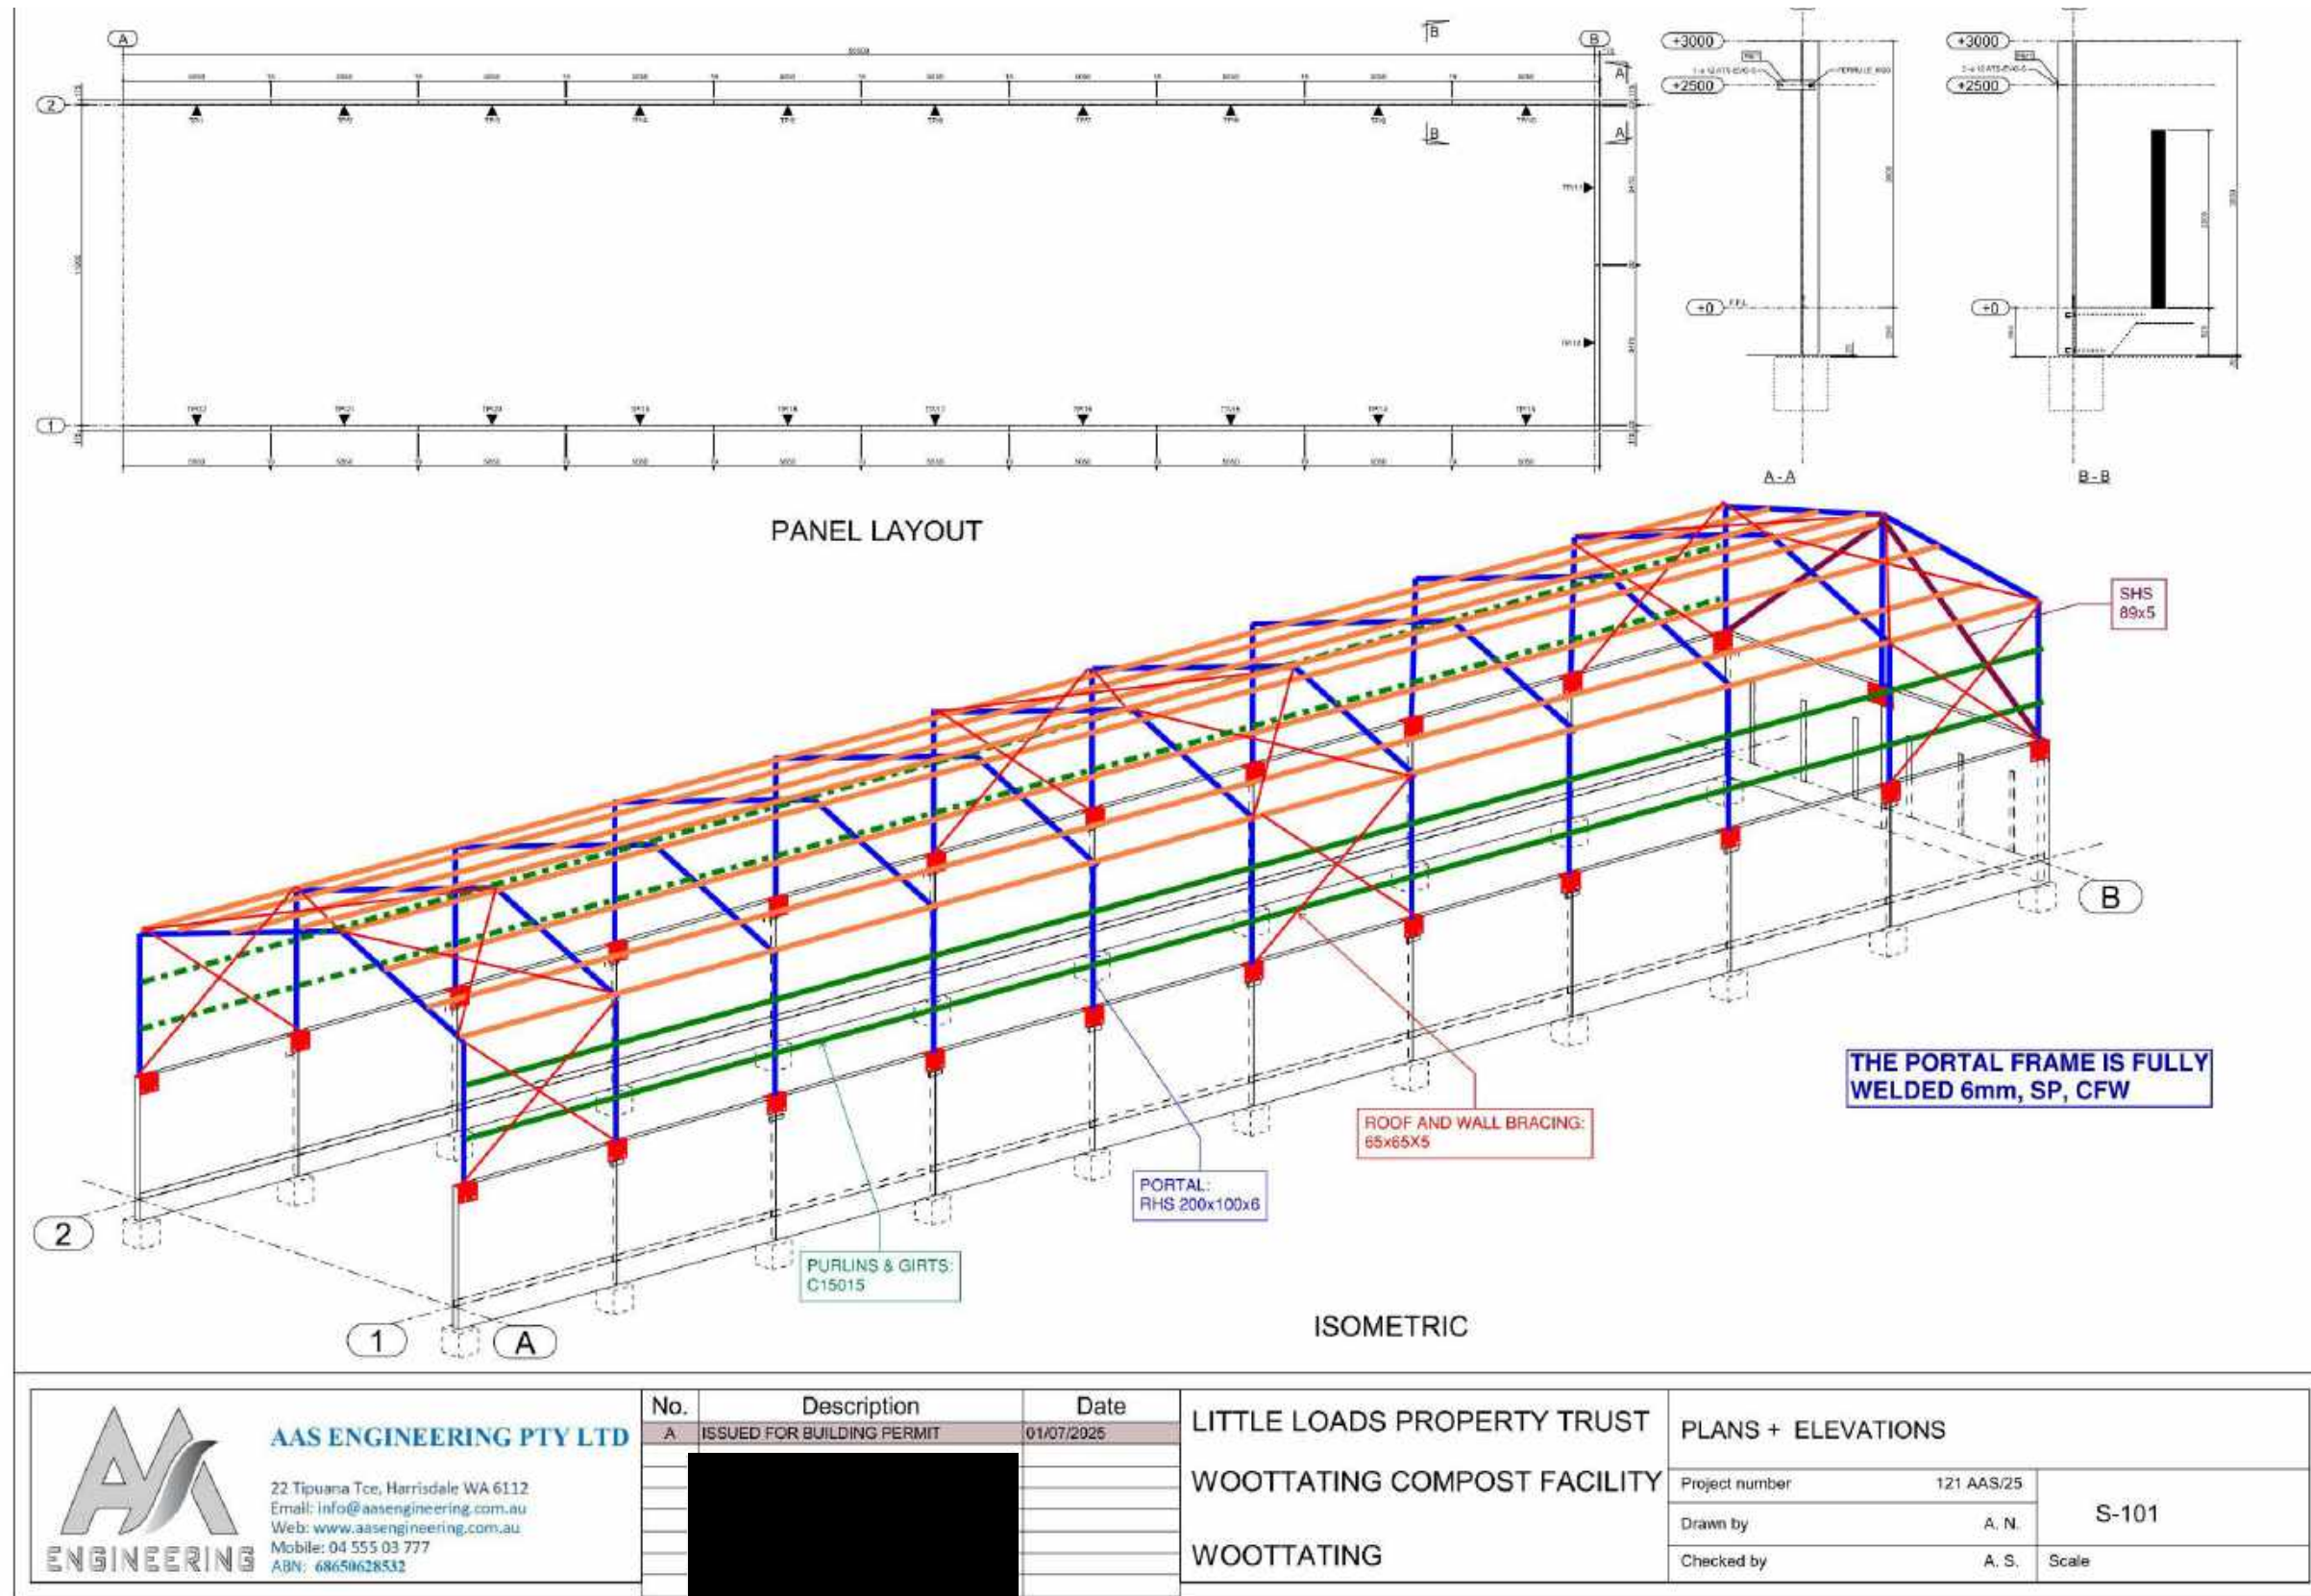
Purearth's Woottating Site Proposed Composting Bunker System
